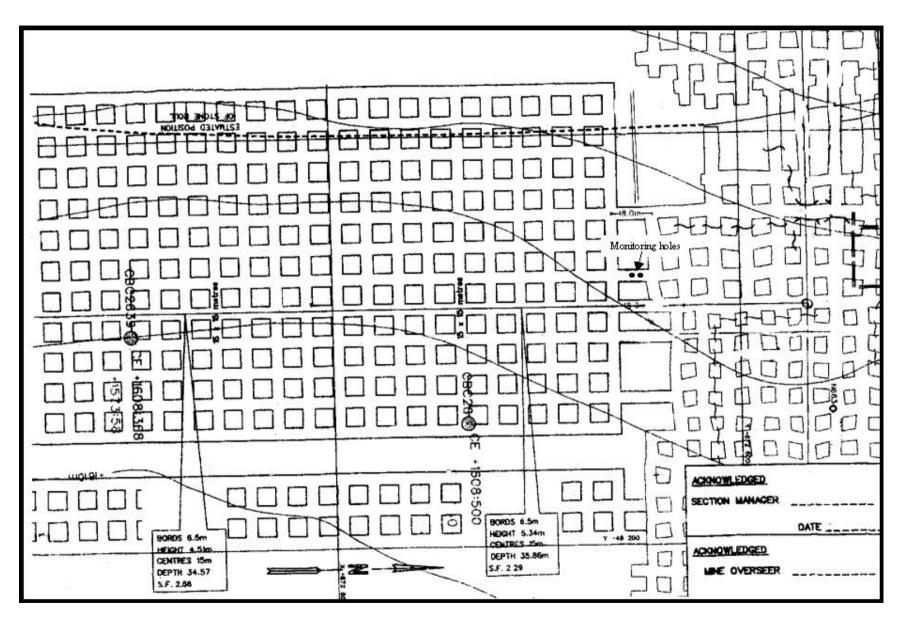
Section plan Colliery 'B' Site 2 (not scaled)
